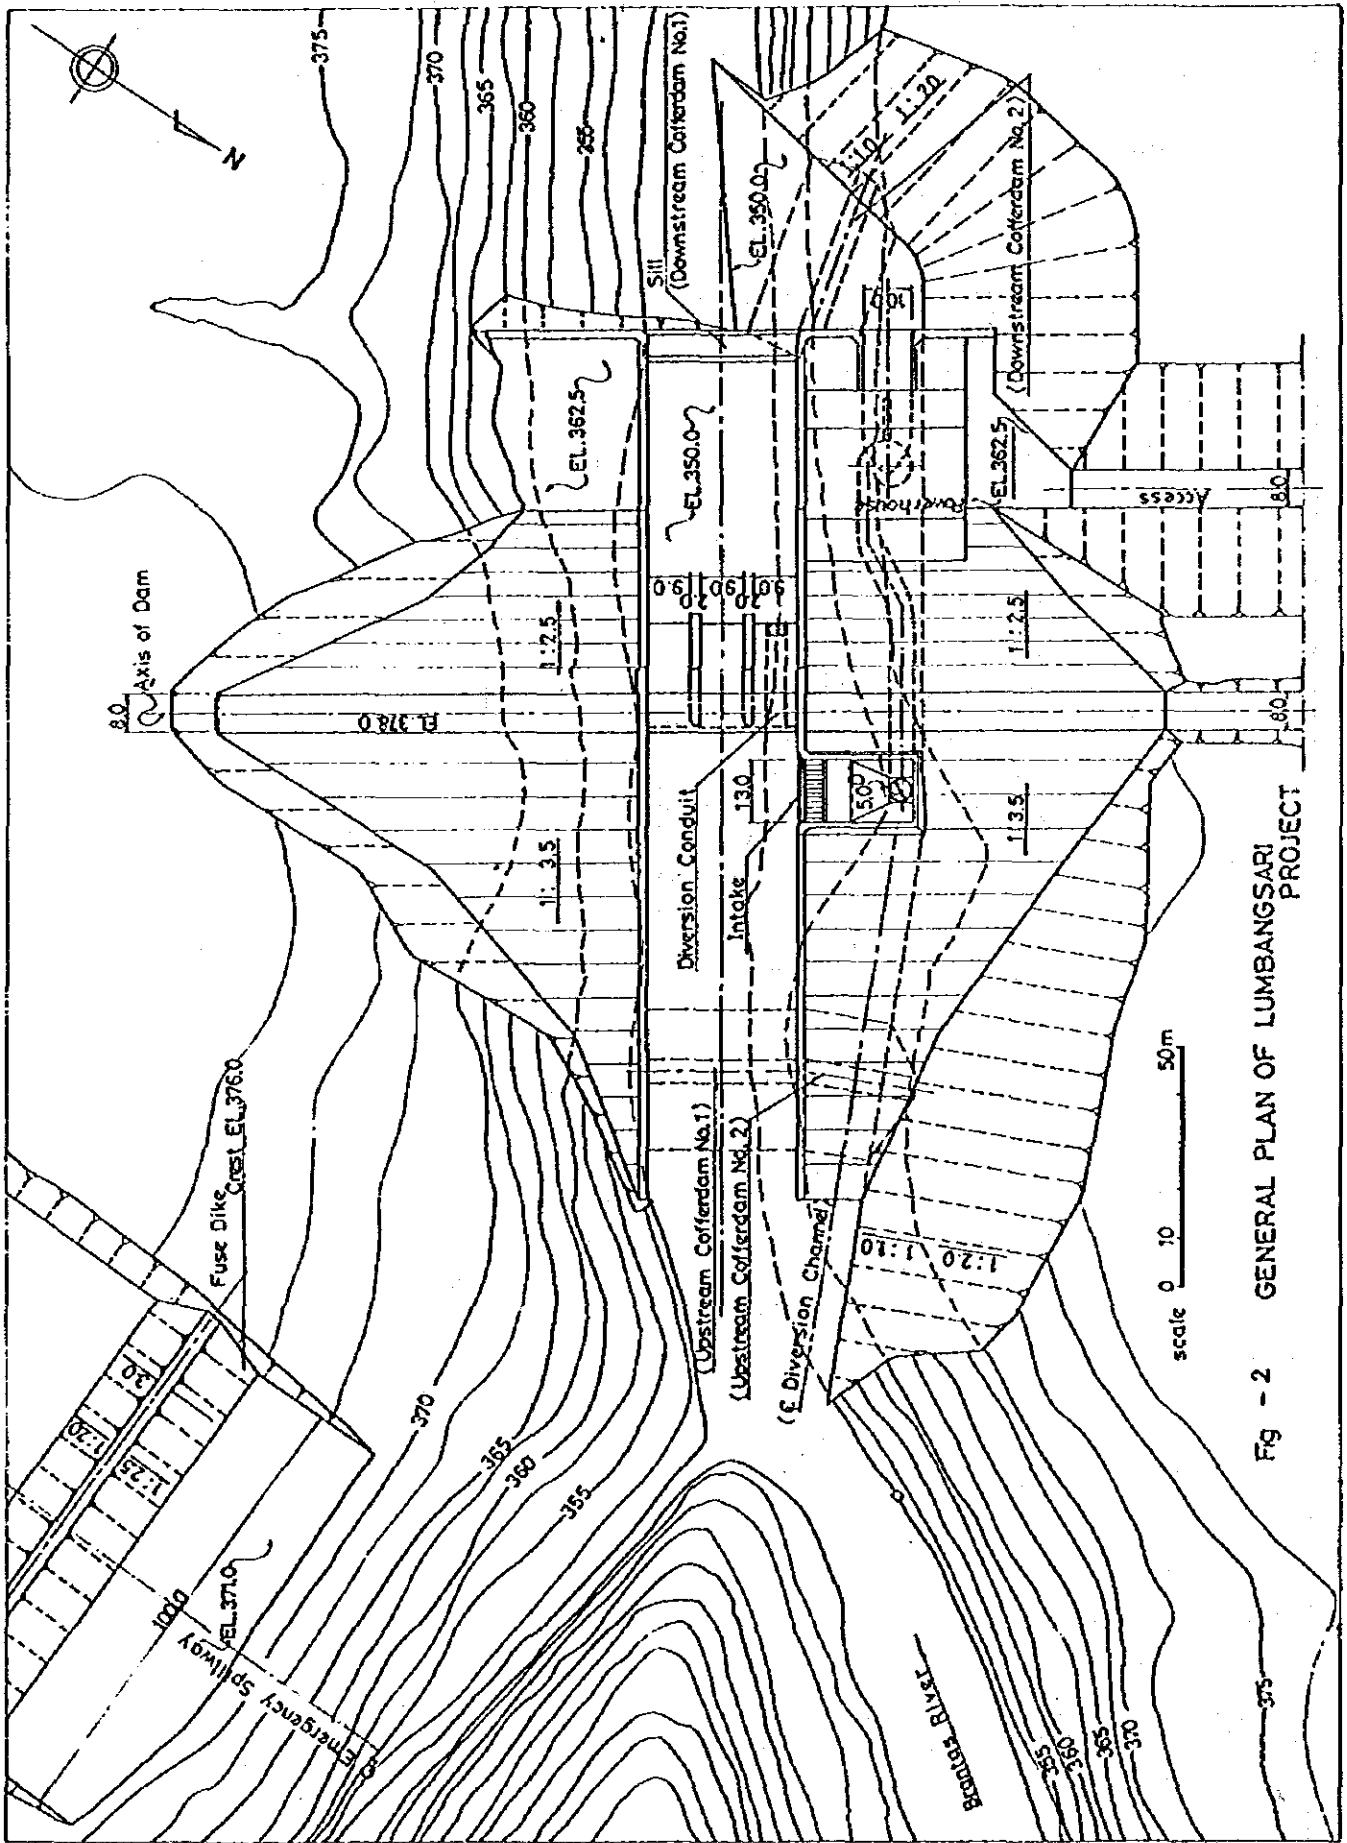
GENERAL PLAN OF LUMBANGSARI PROJECT
